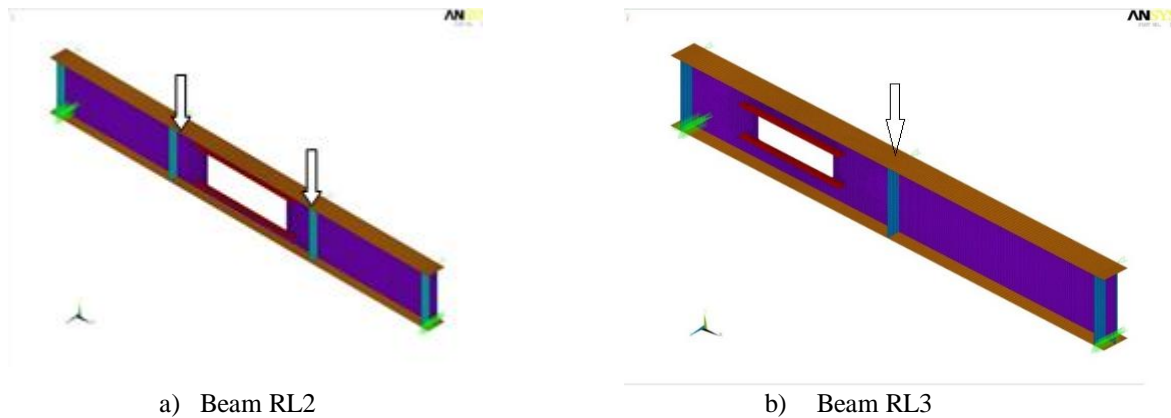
Typical finite element model by authors for beams used in verification from Lupien and Redwood [3]
